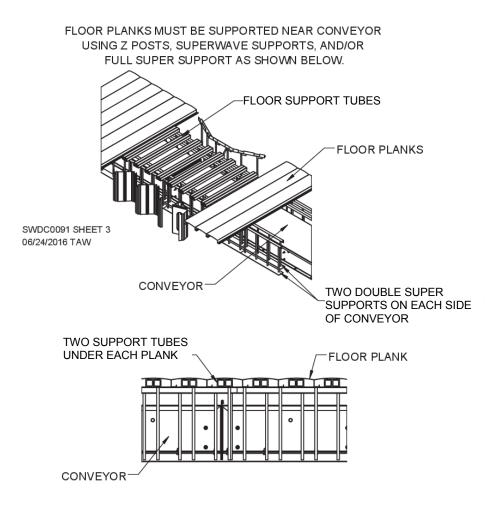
Planks over conveyor supported by two tubes and two Double Super Supports, shown from above and from side
